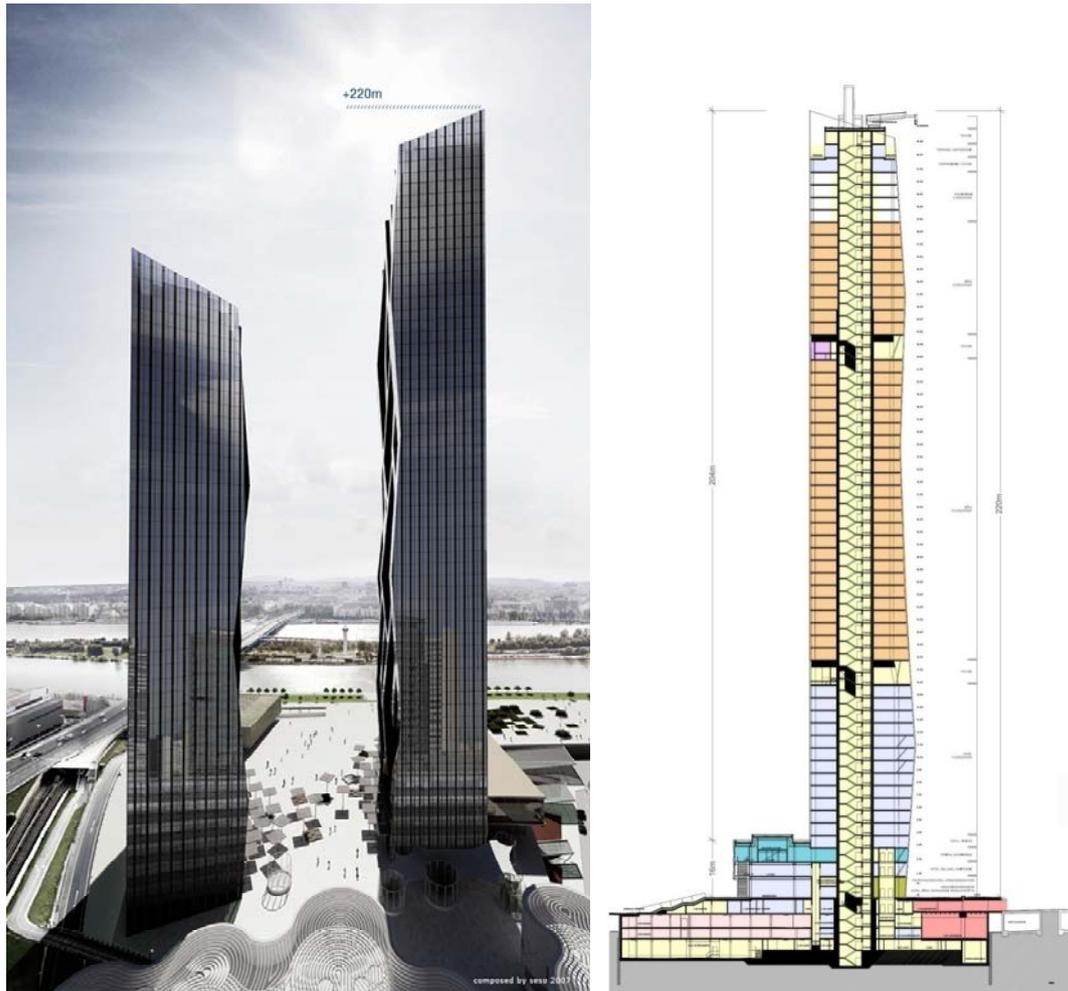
A new urban landmark in the north of Vienna: DC Tower 1 (220 m) to the right and DC Tower 2 (168 m) to the left. Typical cross section of DC Tower 1 including underground floors is shown on the right.
